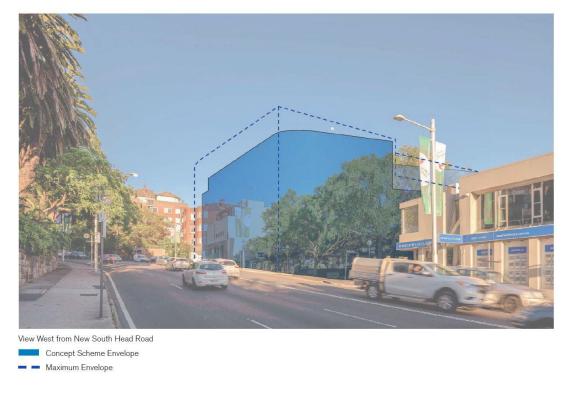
Development concept massing envelope shown in the proposed maximum building envelope viewed from the east on New South Head Road (source: Tzannes)
